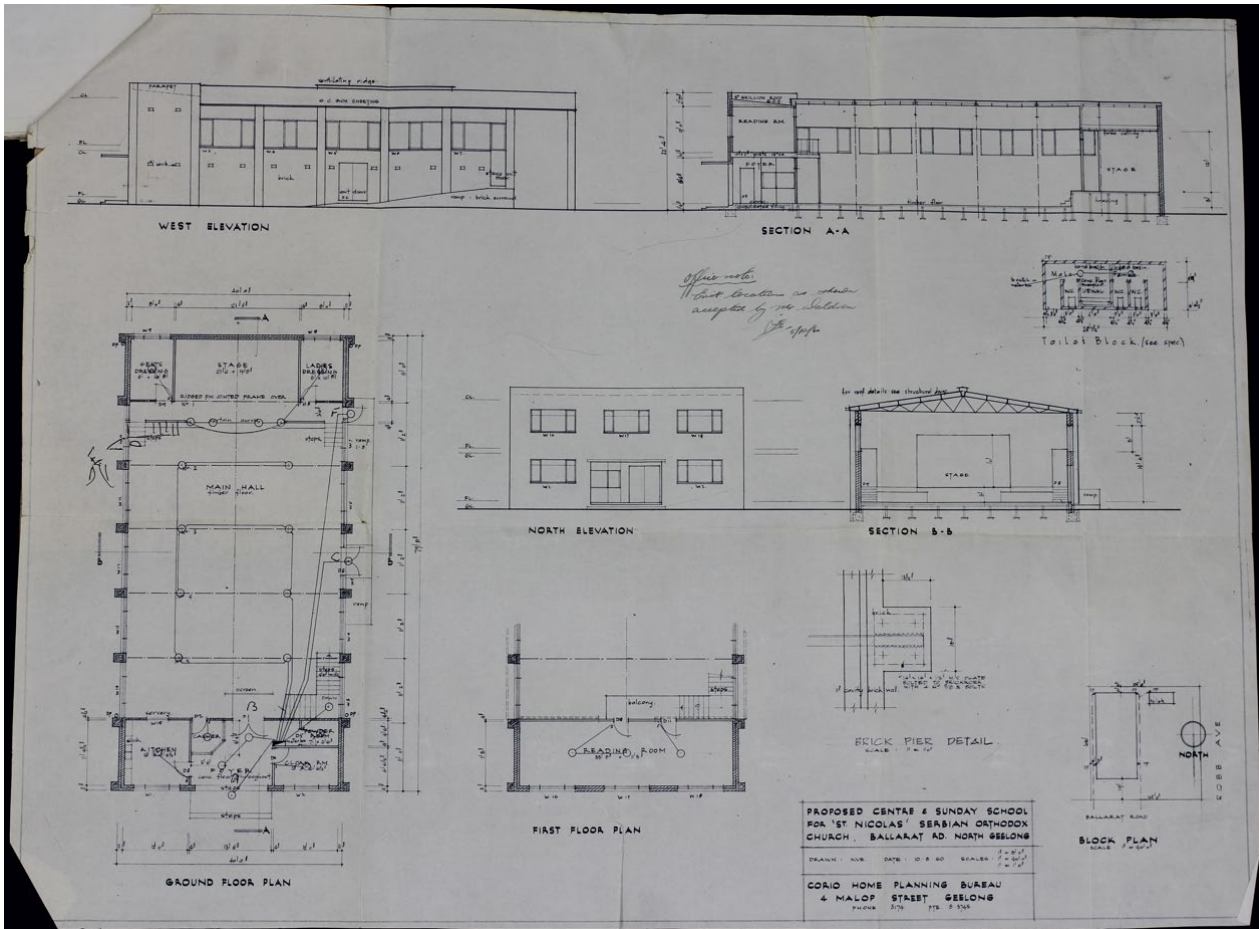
Architectural drawings for the Church Hall and Sunday School, 1960. Source: Public Records Office of Victoria, St Nicholas Serbian Orthodox Church Ballarat Street NORTH; Geelong Churches Church Halls Sunday Schools, VPRS 7882/P0001, 12398
